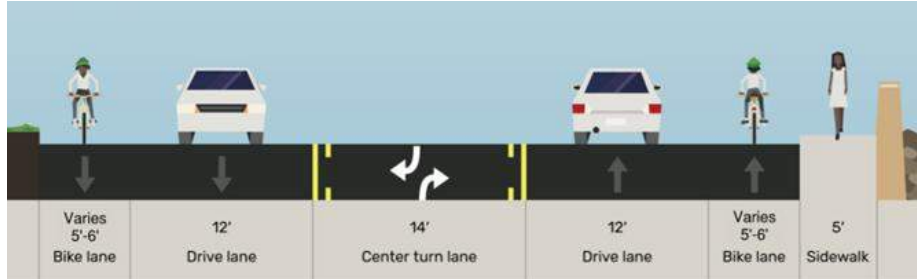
Recommended Typical Cross Section from Jerry's Flat Road to south of Harbor Way (Facing South)
